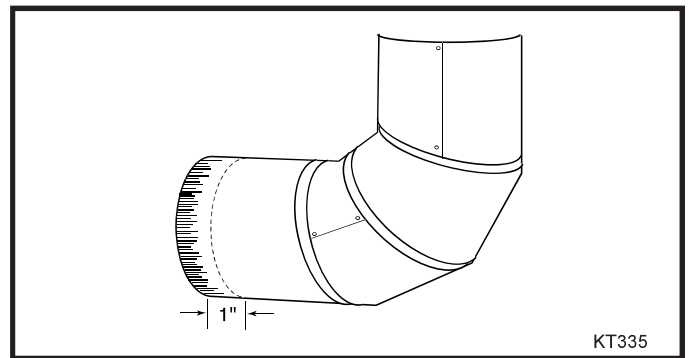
Drill three holes for sheet metal screws in the elbow's ends.
